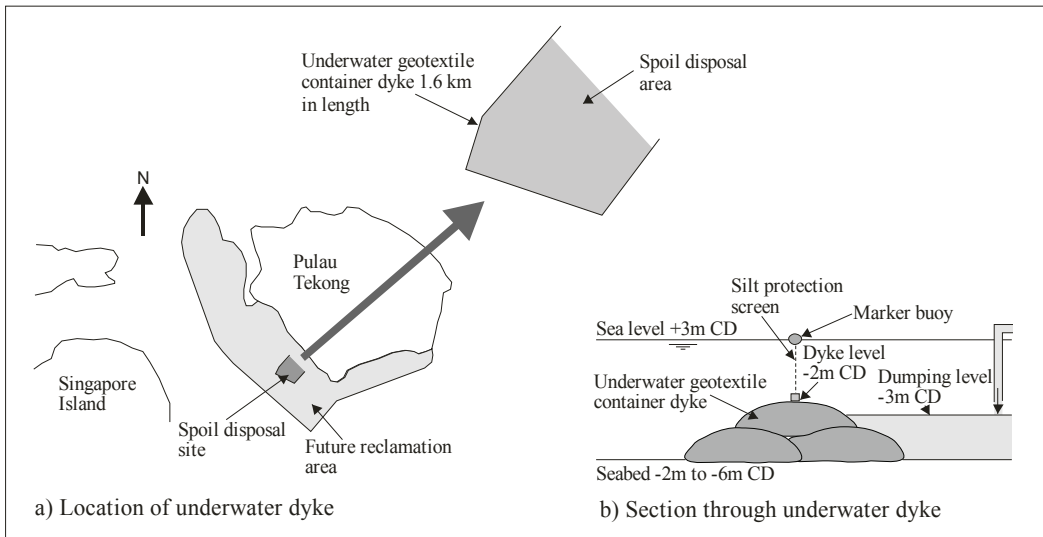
Geotextile containers to construct underwater containment dyke, Pulau Tekong offshore disposal site, Singapore.
